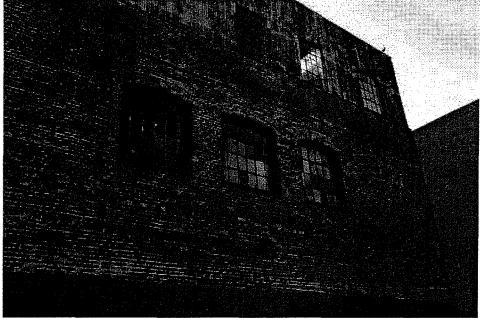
Steel-sash windows at second and third floors of the west façade. Looking east.
